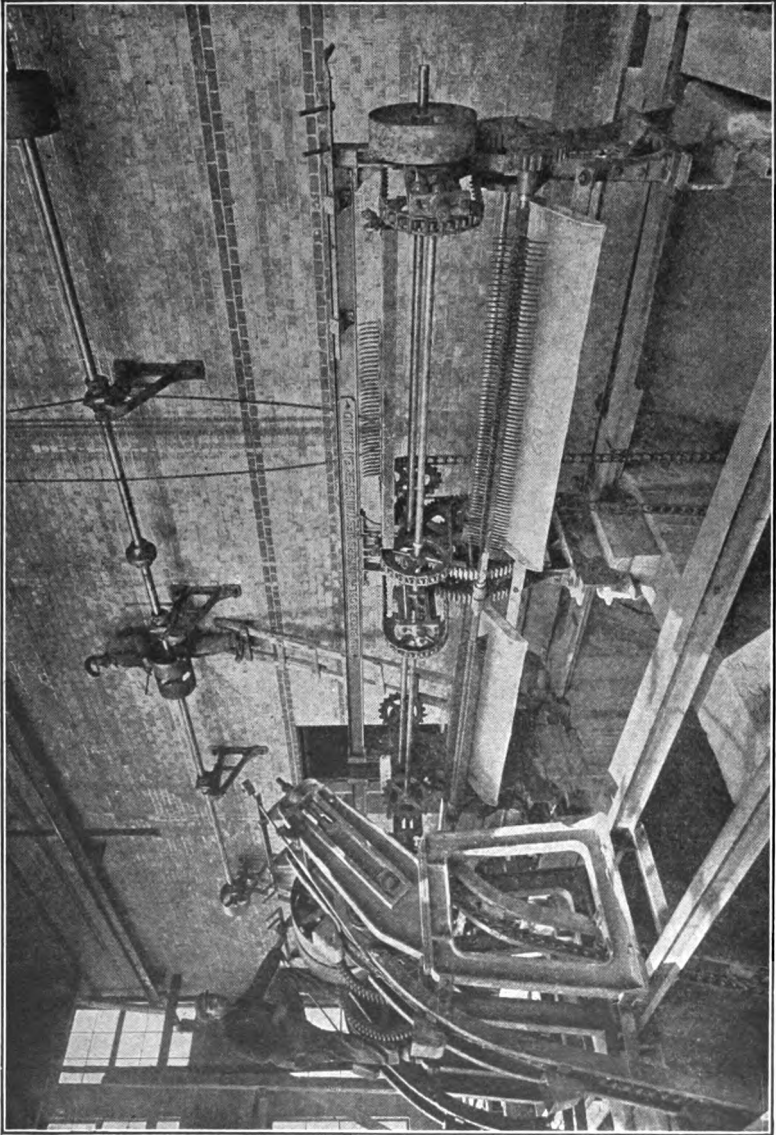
Headframes of rack-cleaning apparatus and grit elevator, Toronto.
